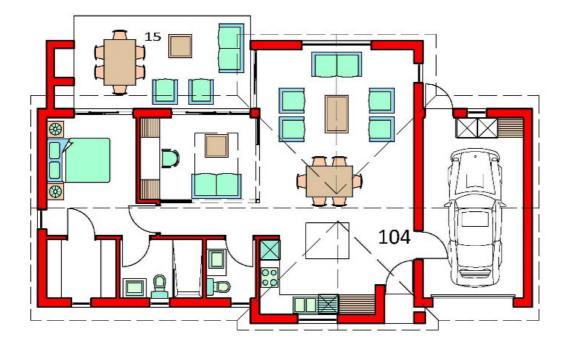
Floorplan of variation – south entry (Type B) – 104m².
